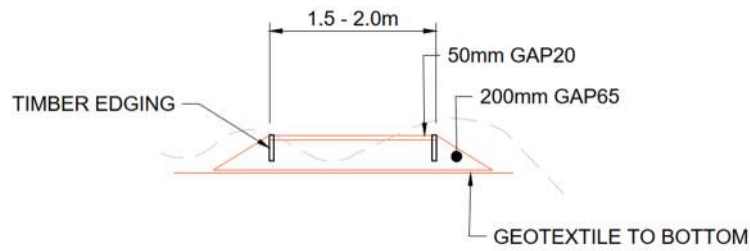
Typical cross-sections for loose sand ('Type R' pavement)
